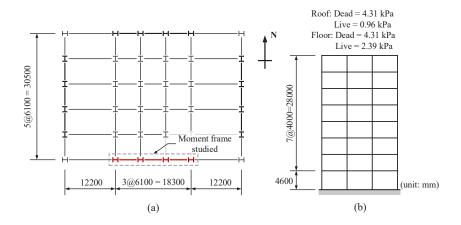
Typical 8-story archetype steel frame building: (a) plan view; and (b) elevation.
